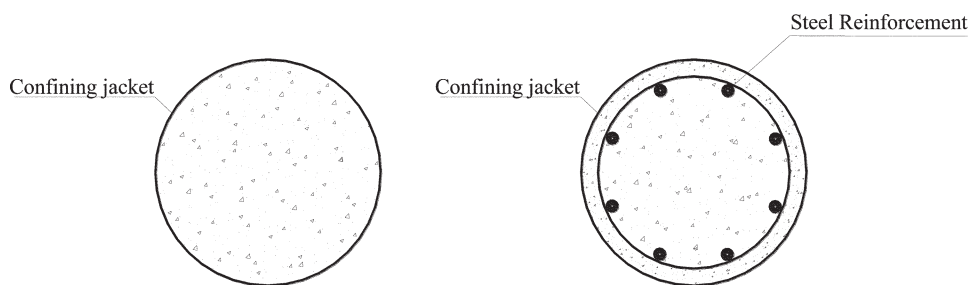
Circular section confined by steel stirrups and/or FRP jacket.
